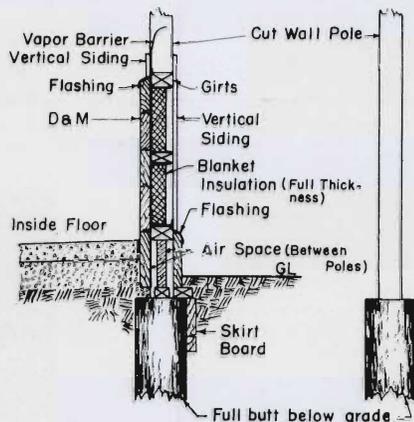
Wall construction used in the pole frame hog farrowing house.
